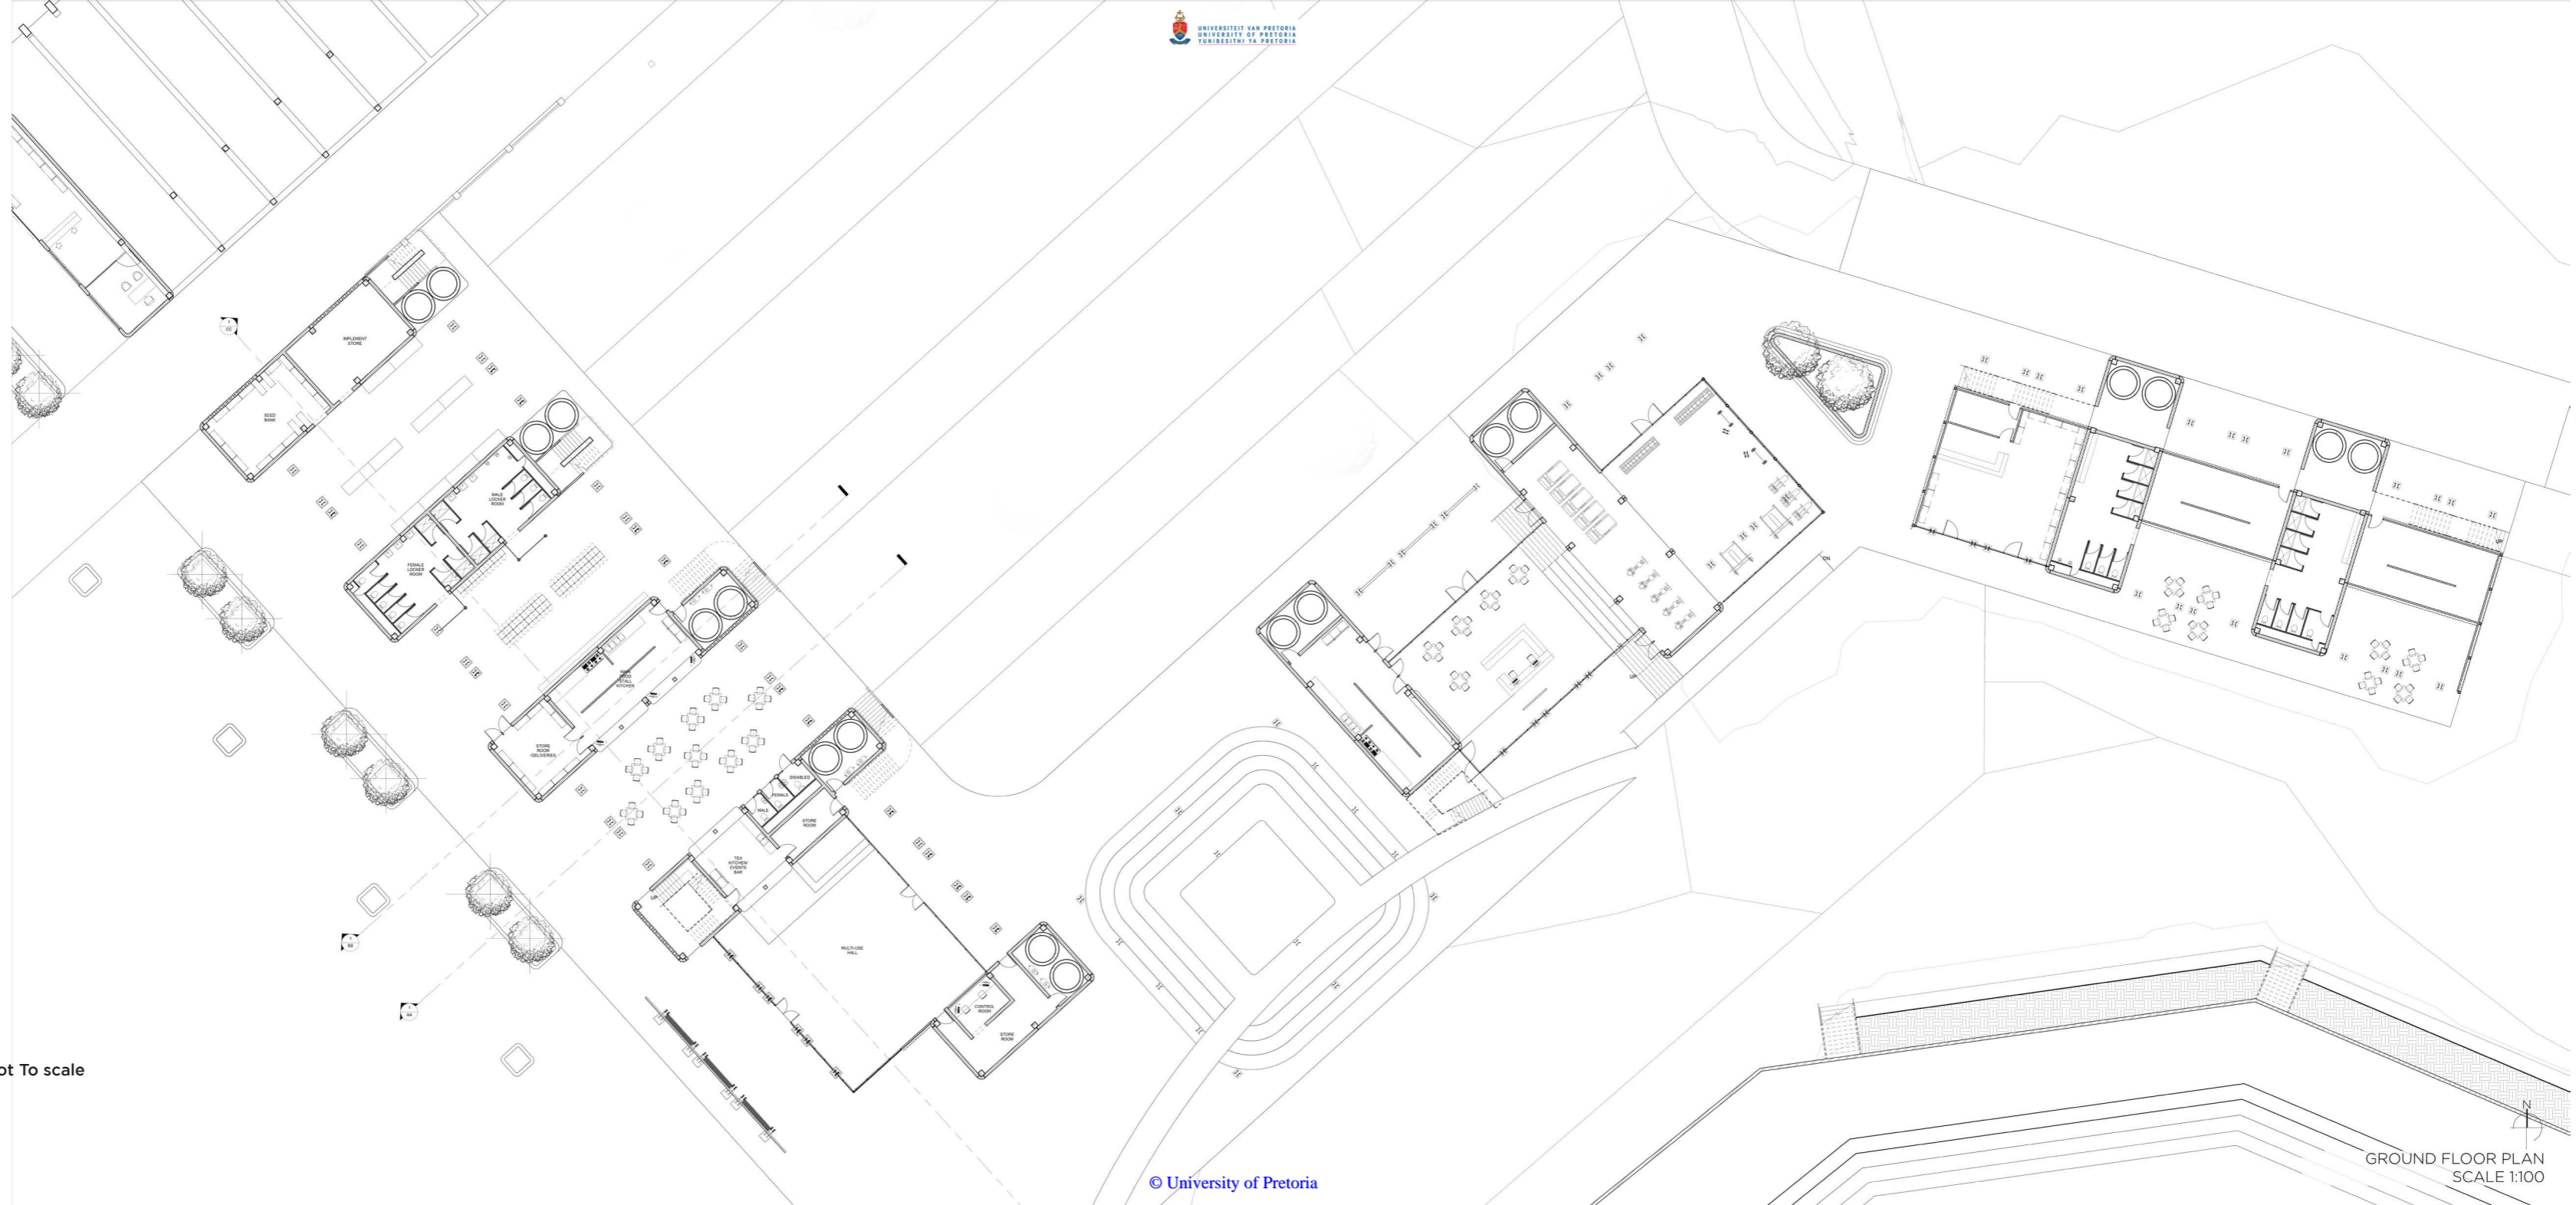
Quarter 3 Crit Ground Floor Plan - Not To scale
